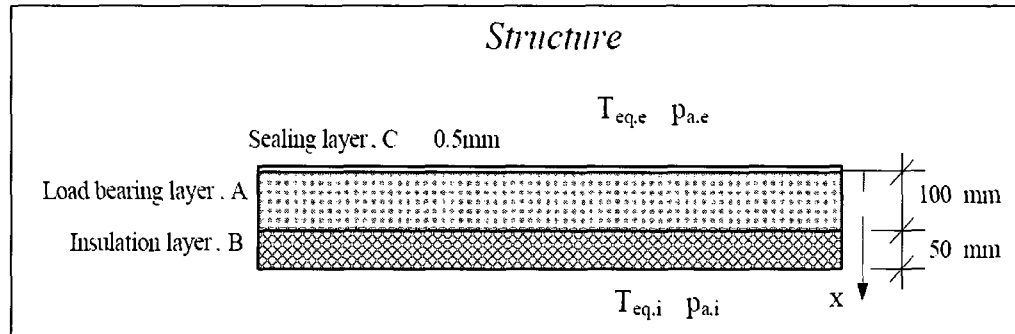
Construction detail of benchmarking case “insulated roof”
